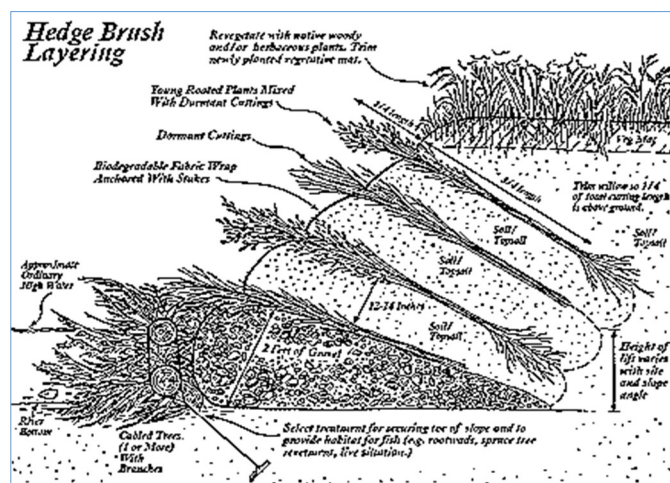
A schematic view of roadside slope protected by brush layering integrated with other vegetation system and civil engineering structures (Source – open source)
